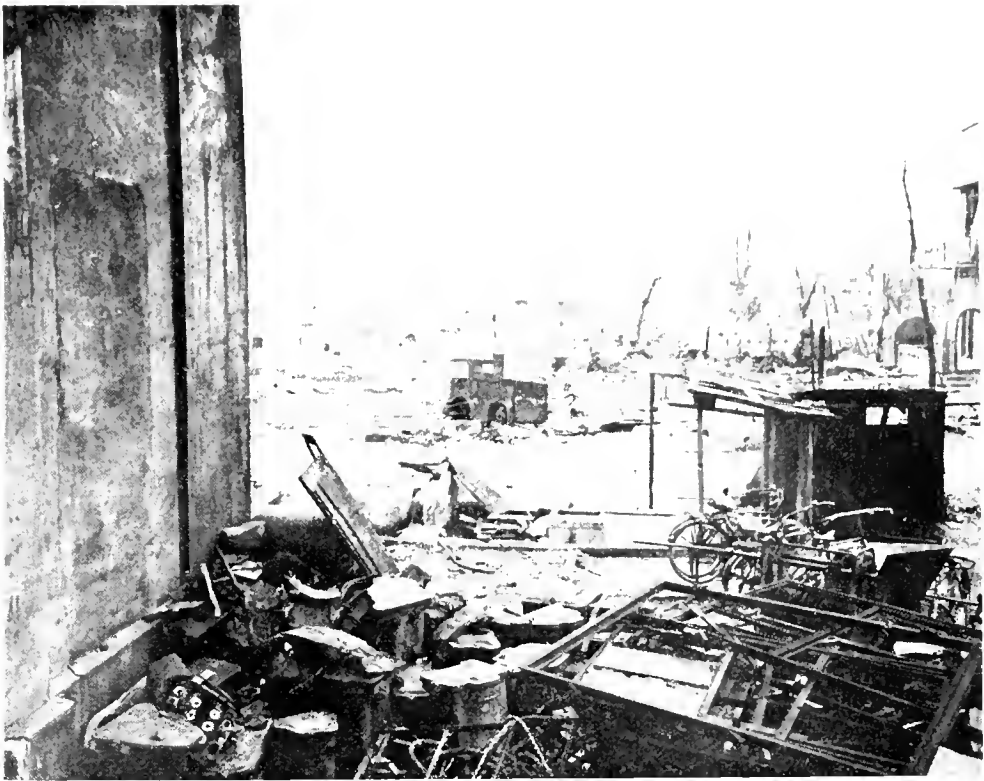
Kojimachi substation—General view of surrounding territory showing complete destruction. Diet Building in center background
